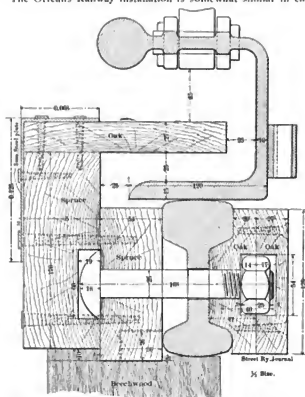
SECTION OF THIRD-RAIL CONSTRUCTION USED IN STATIONS
